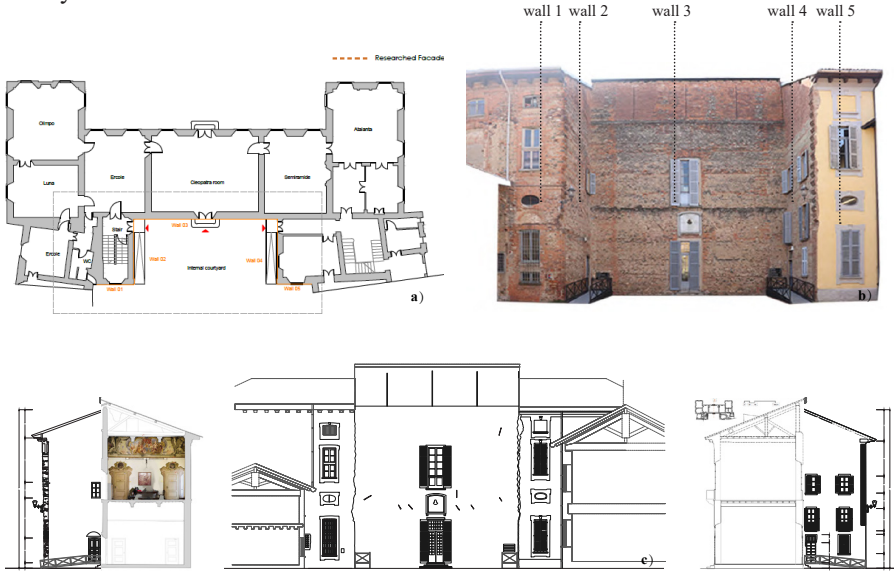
a) Trotti Palace ground floor plan; b) Intergration of main elevation; c) Main wall sections
